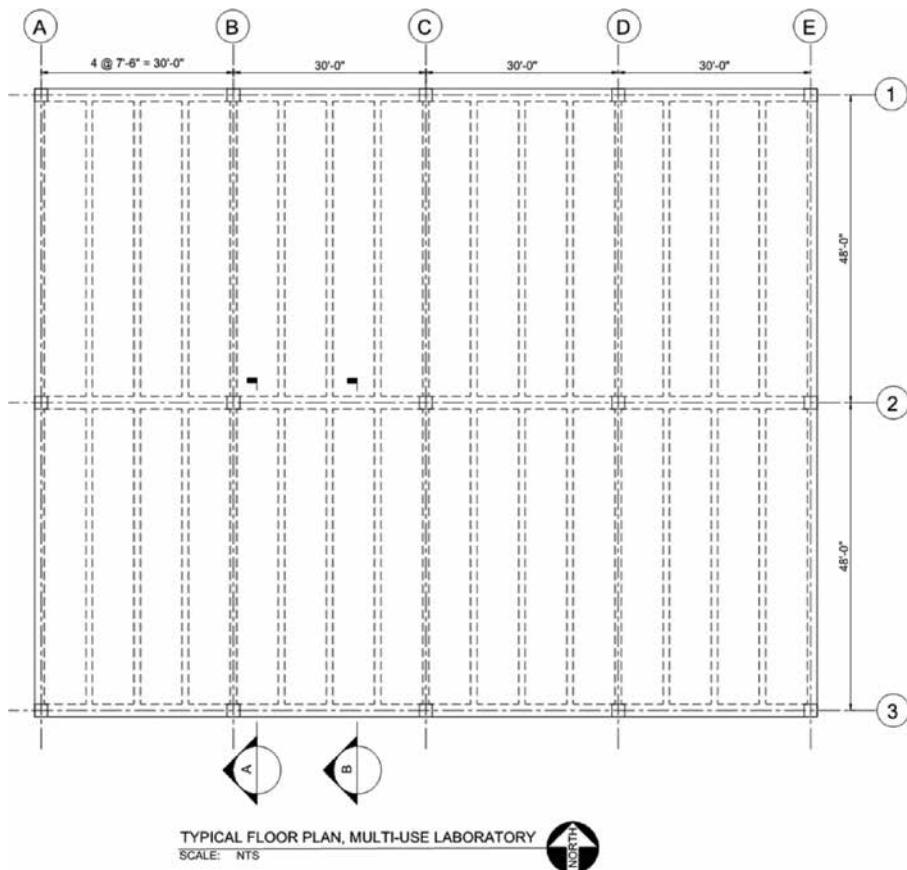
Typical floor plan, multi-use laboratory (Fig. 6.1a in Reference 3)
